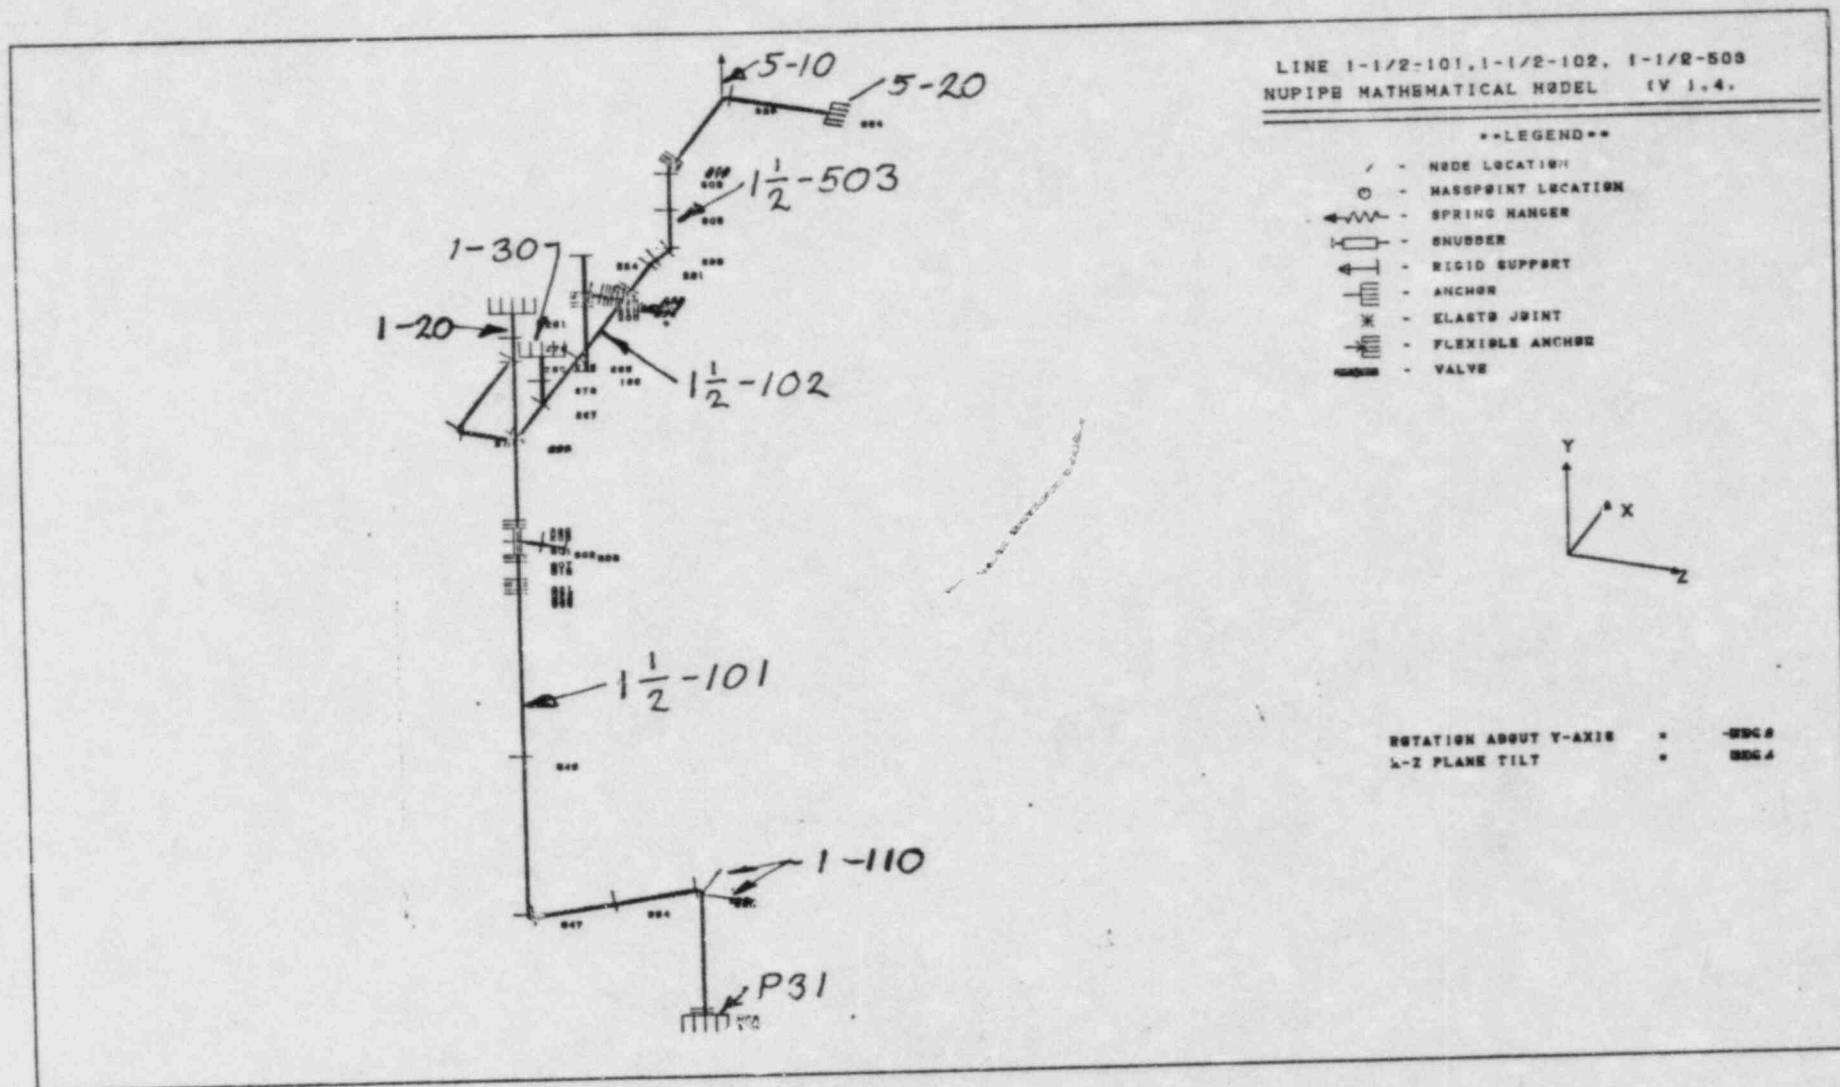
Detail - lines 1 1/2-101, 1 1/2-102, and 1 1/2-503.
